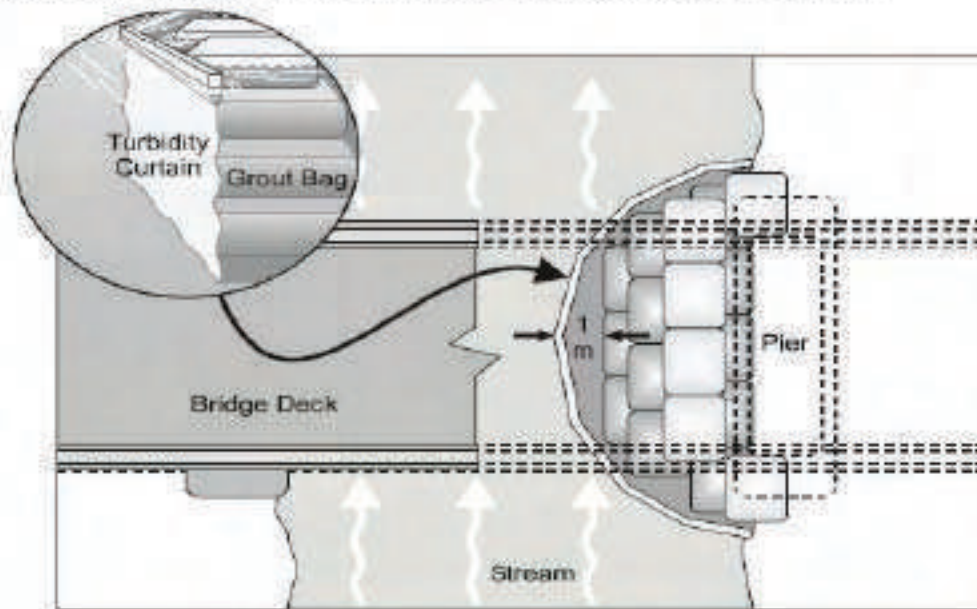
Grout Bags used for Local Scour Armoring (Riprap Substitution)
